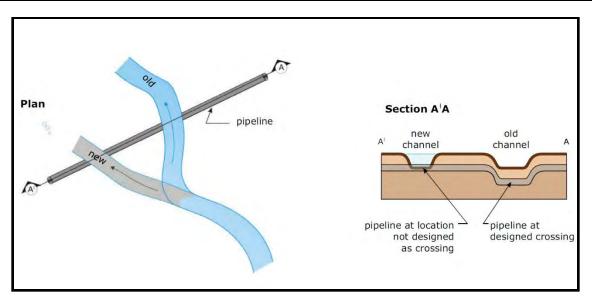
Example of avulsion in plan view (left) and cross-section (right).
